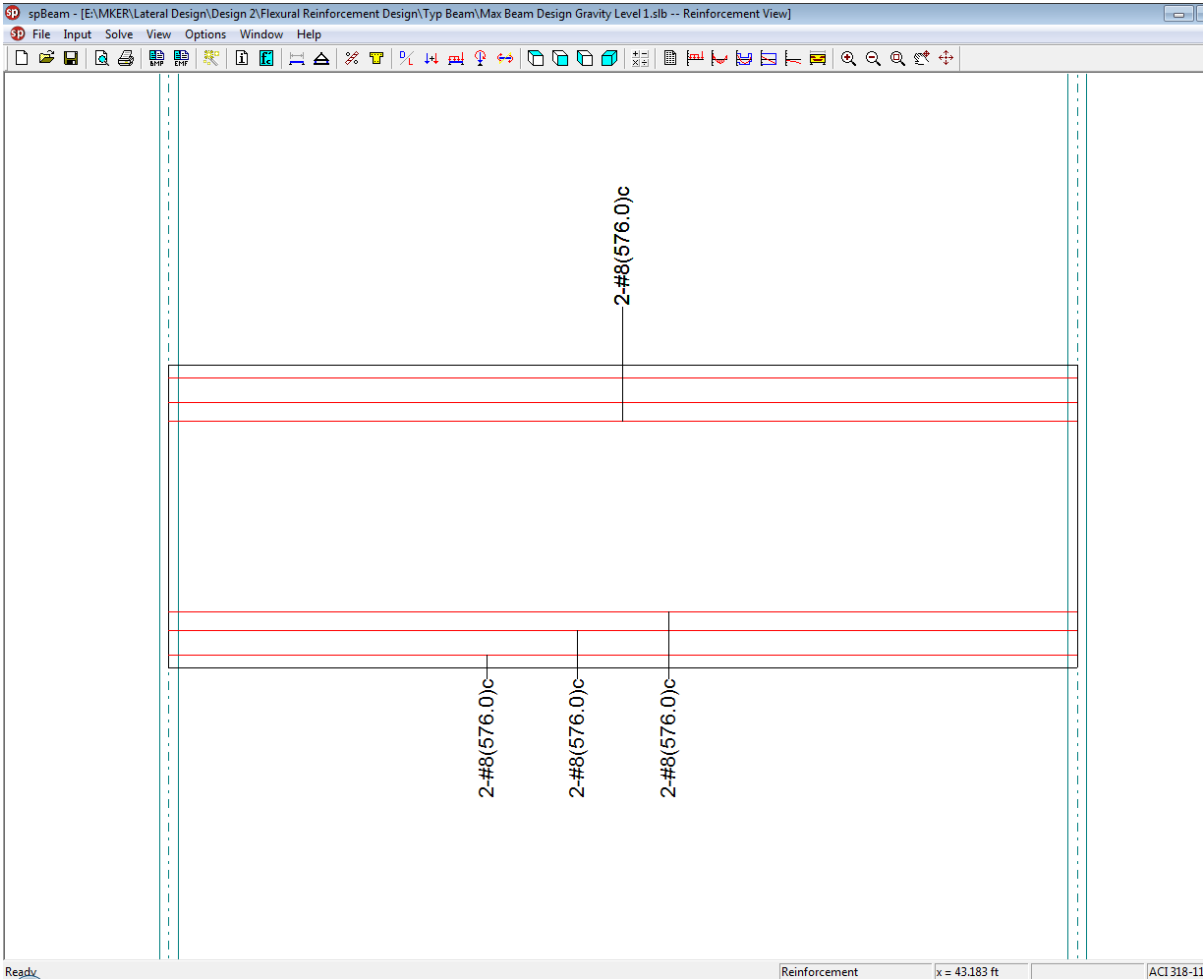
, spBeam Flexural Reinforcement Design of BG at Lvl. 1
